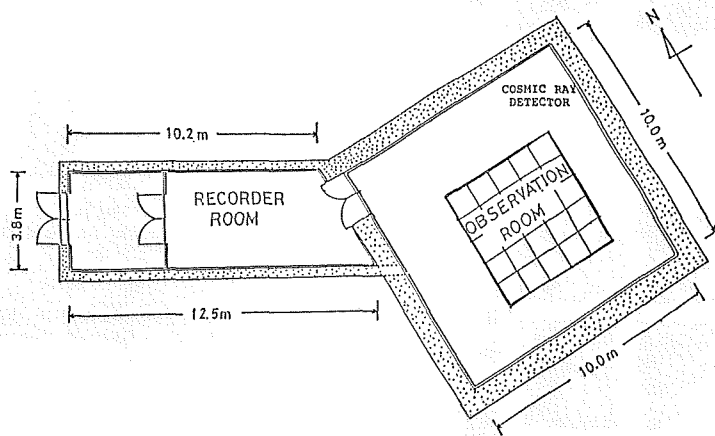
An arrangement of the room in the observatory; the recorder room and the observation room (10×10 m in area).
